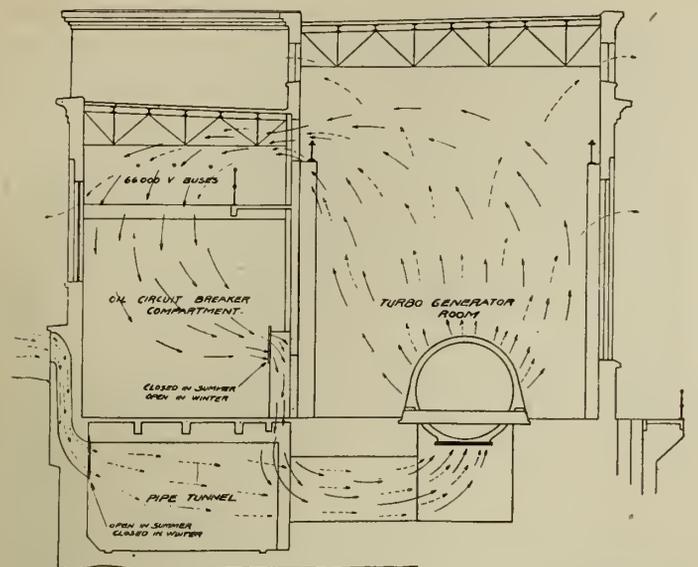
Cross Section of Power House showing Air Circulation.
